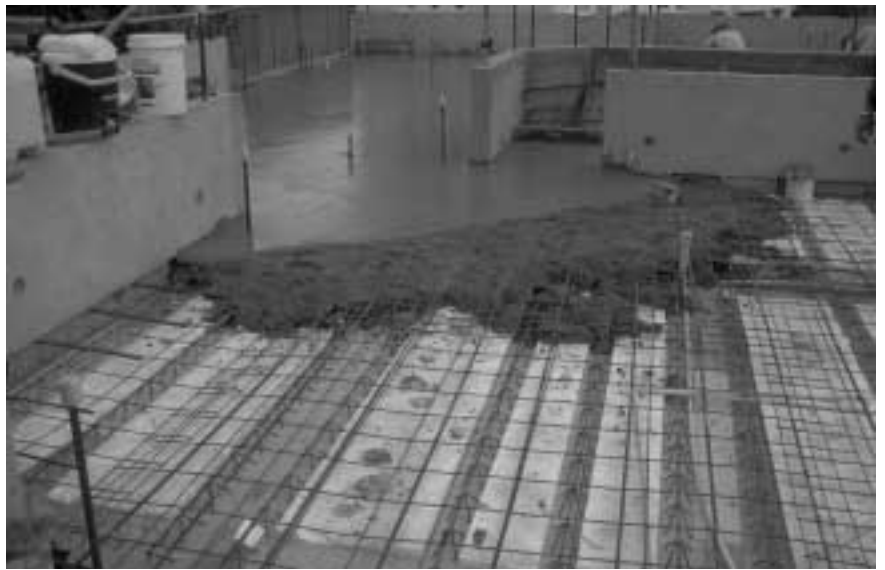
In-situ concrete is reduced by use of polystyrene void formers
